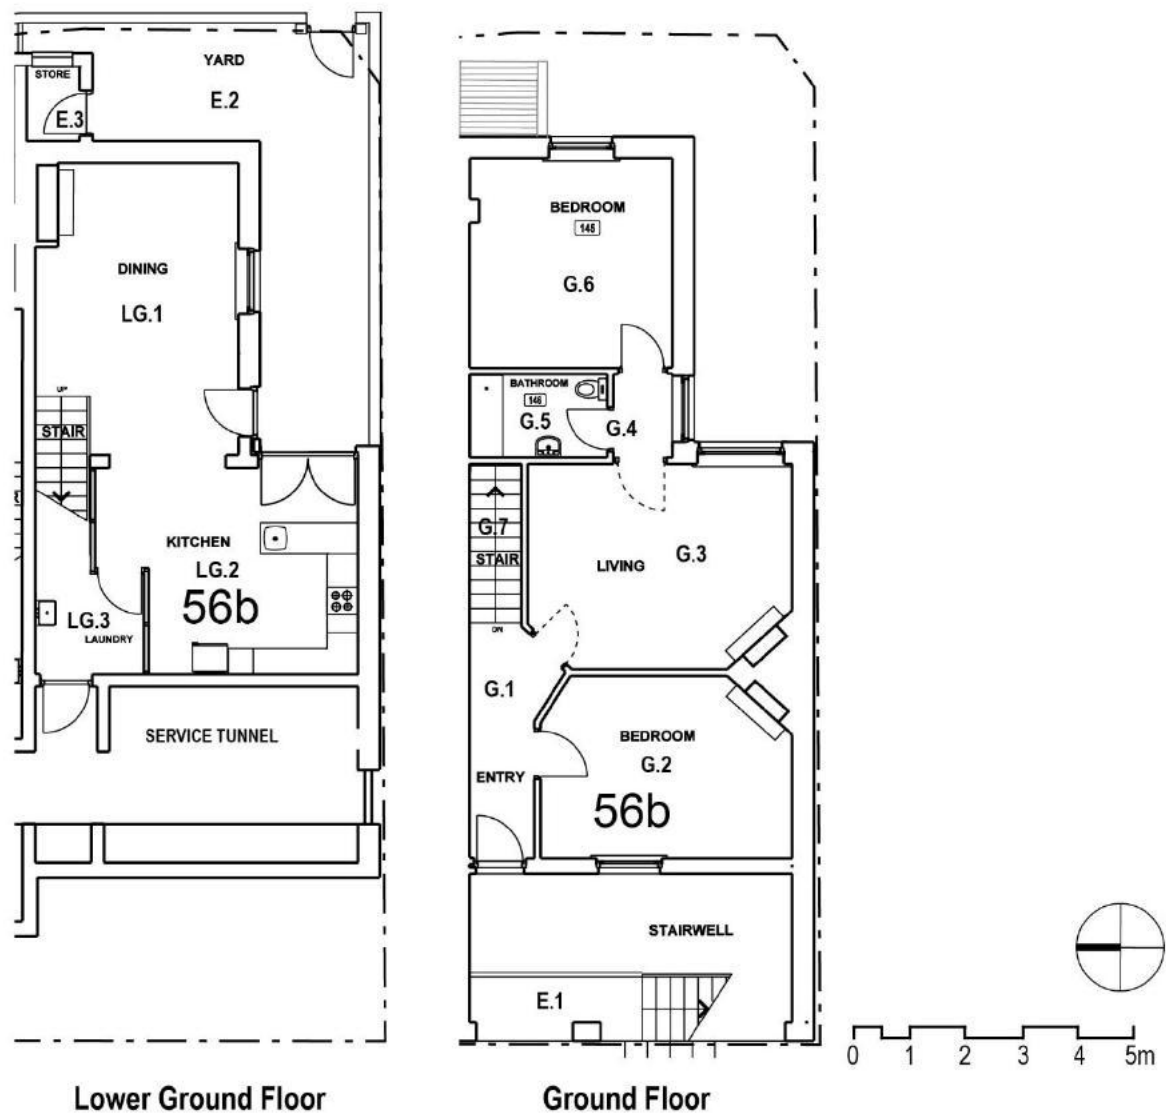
Plans of Flat 56B / 46–56 Gloucester Street showing layout of flat and space numbers, for the first and second floors. (Source: LAHC, with GML overlay 2016)
